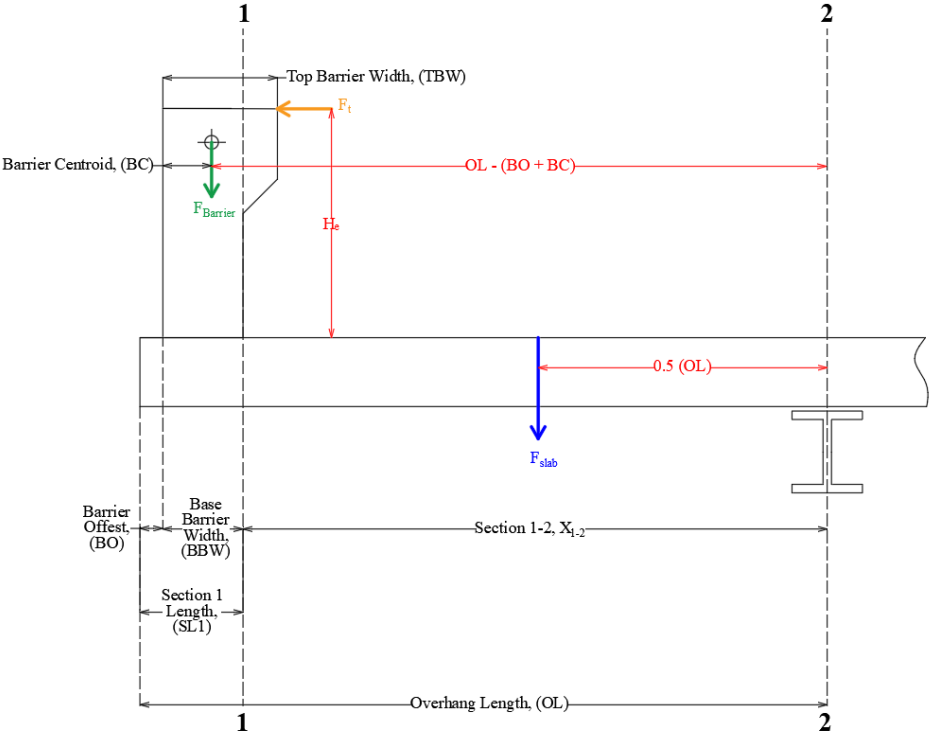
Side View of Design Case 1, Section 2-2 Impact
